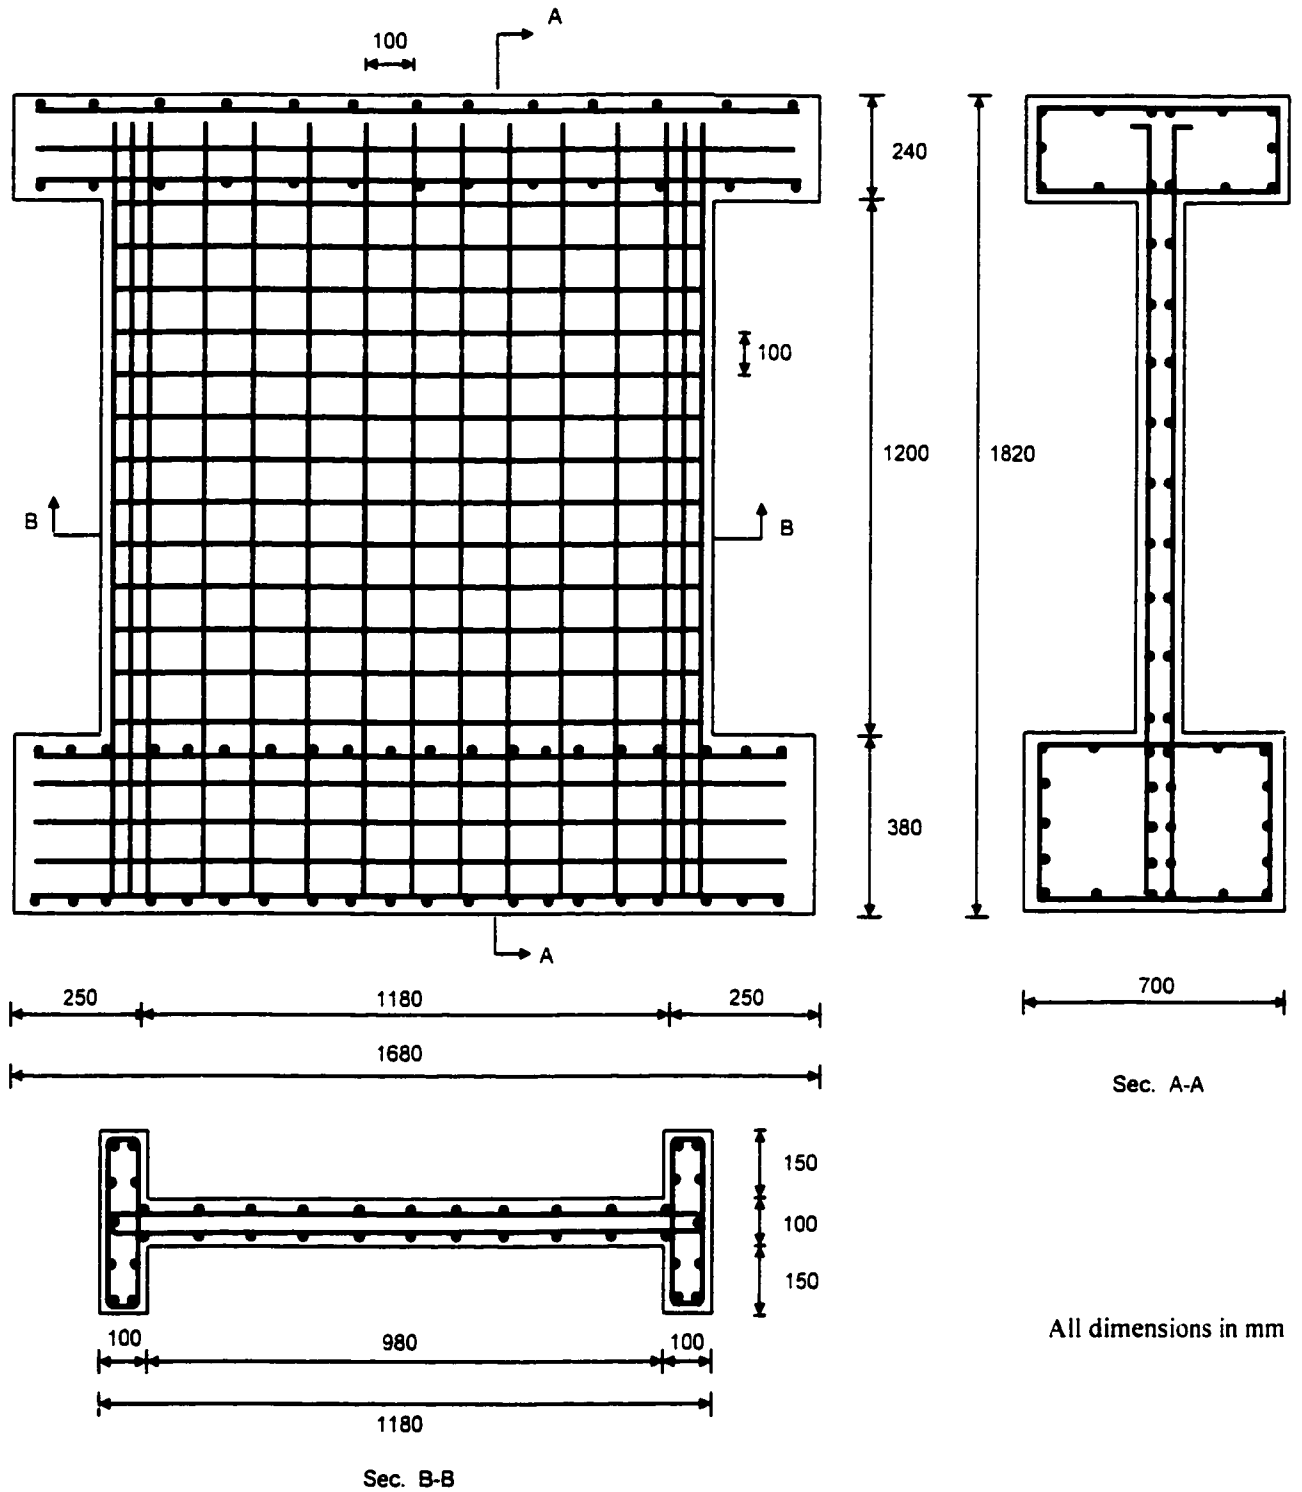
Geometry and reinforcement details of shear walls S2, S3, and S6 tested by Maier [25]
